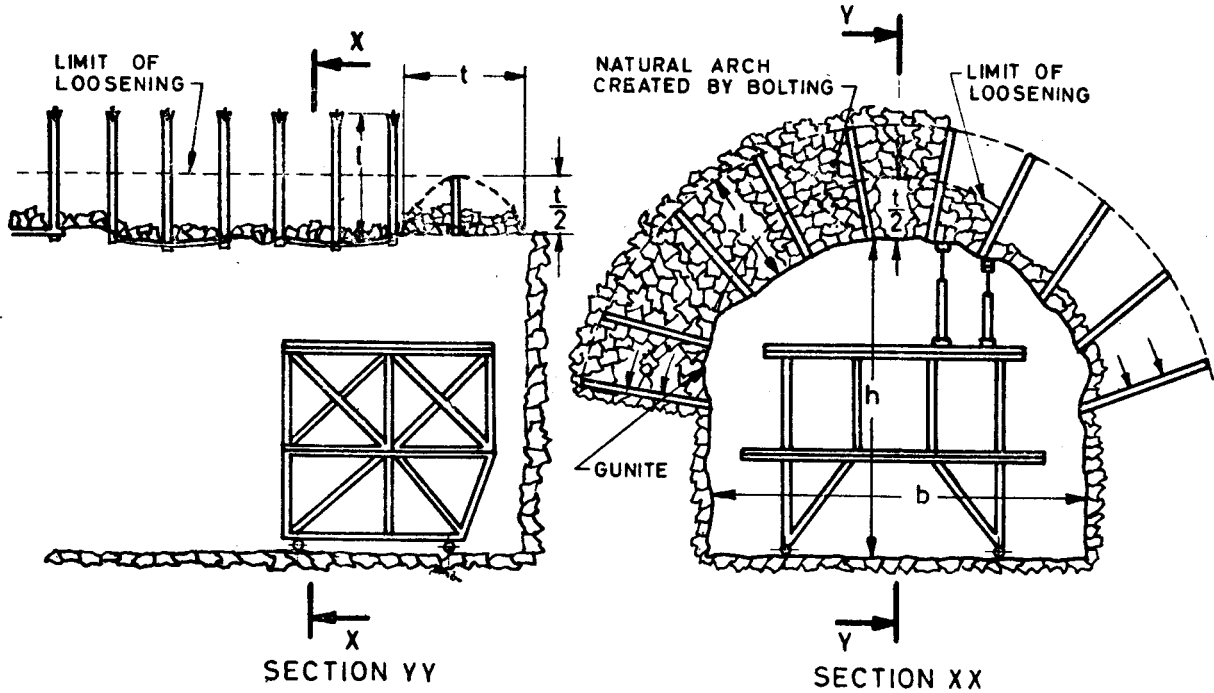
DIAGRAMMATIC SECTIONS DEMONSTRATING PRINCIPLES OF ROOF BOLTING
